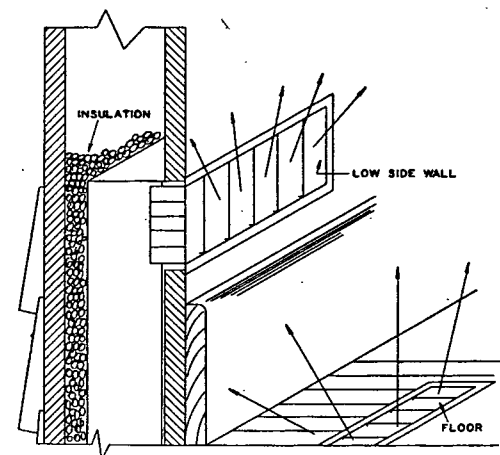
RECOMMENDED TYPE OF FLOOR OR LOW SIDEWALL INSTALLATION ON OUTSIDE WALL^a
